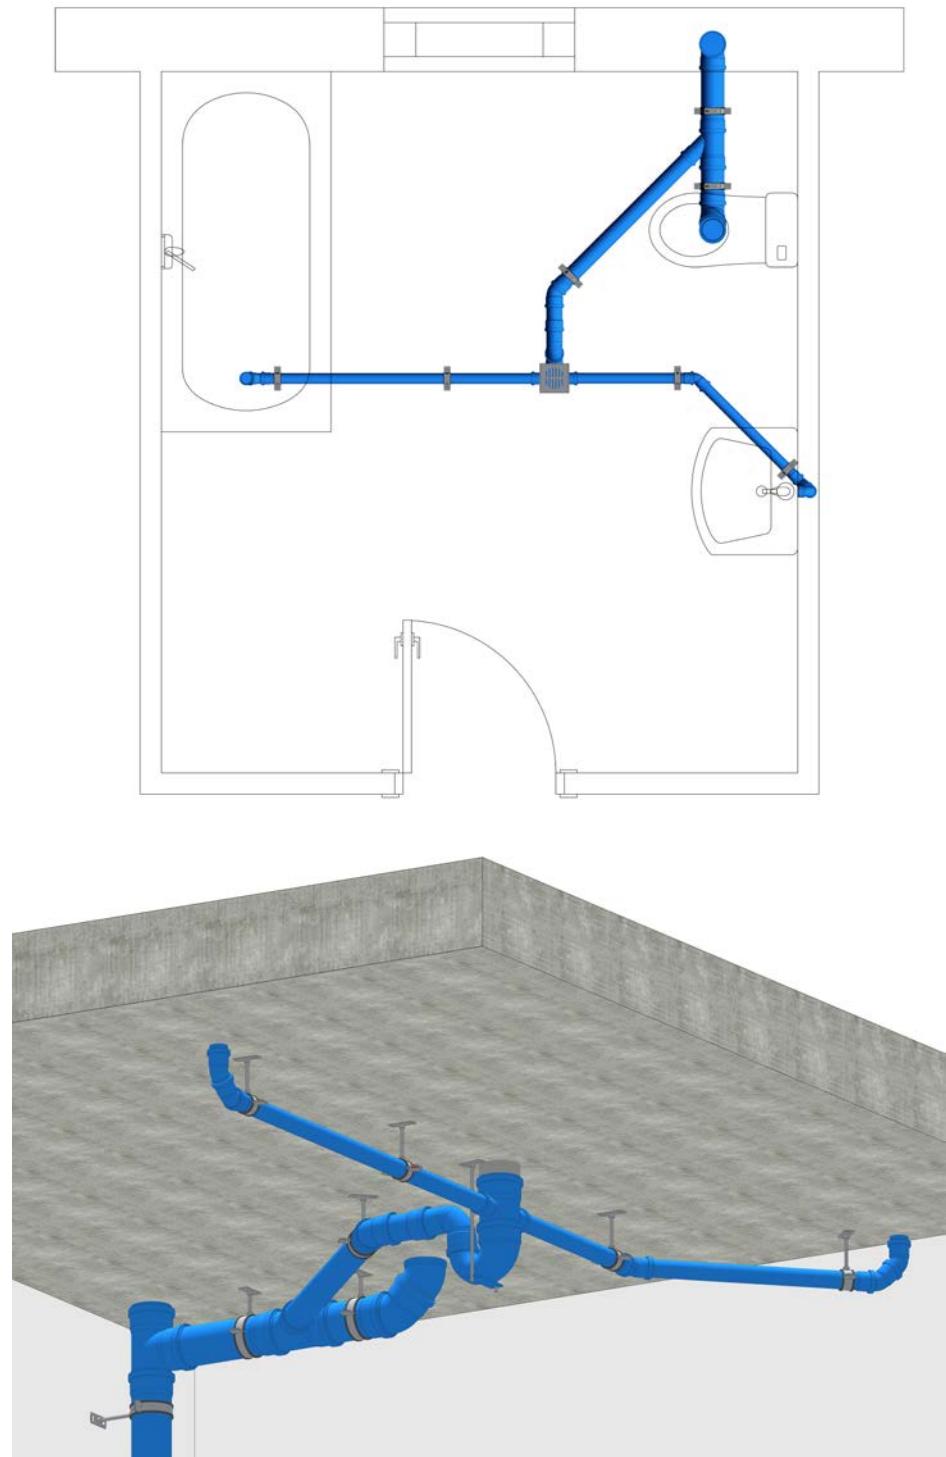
Example of waste branch with P-Trap used as gully trap inside the room and fixed to the slab of the lower floor.
